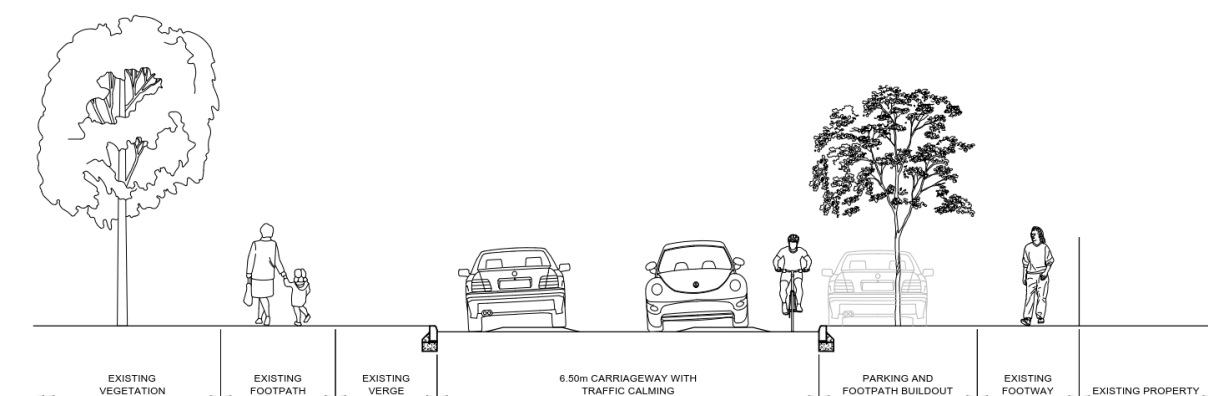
Cross Section Route 5 – Whitehill Farm Road, Stoneybank Terrace
